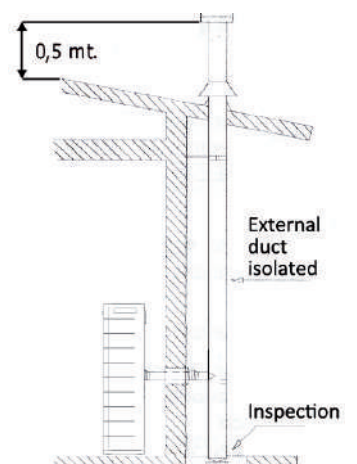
connection to an external flue with insulated or double-wall pipe.
